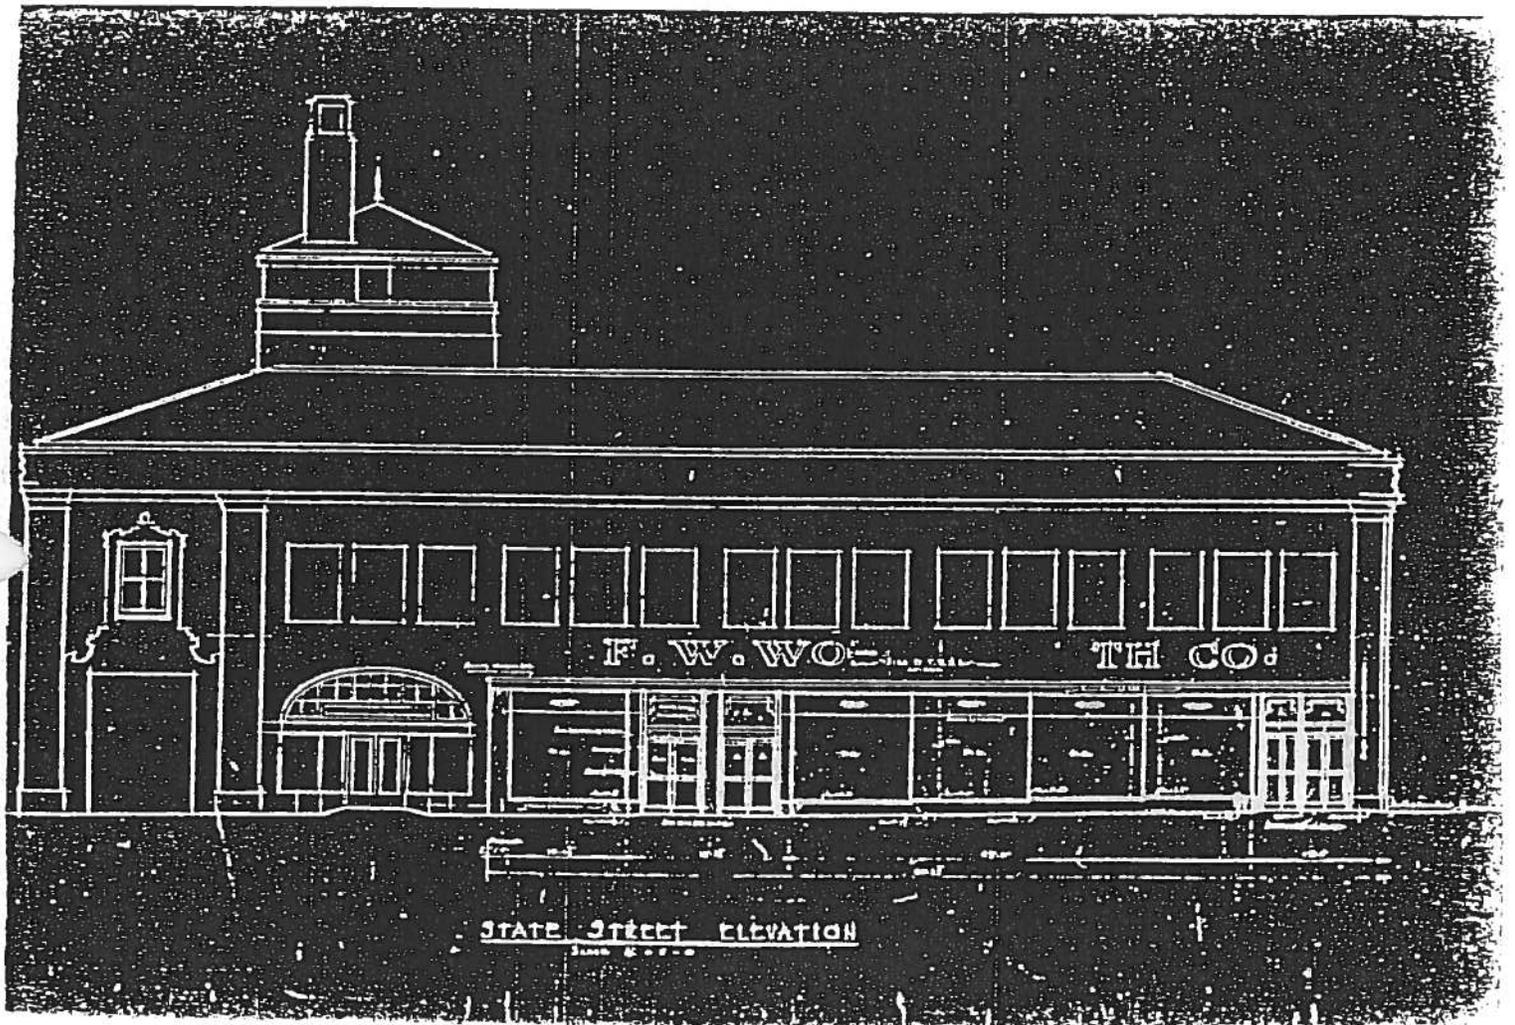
Woolworth's Architectural Plan 1949-State Street elevation
